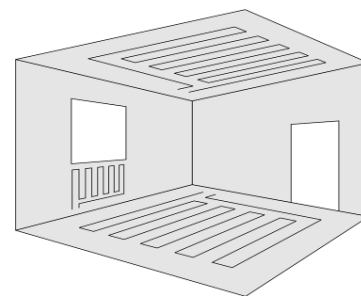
Examples of an ERHS built into the floor, wall and ceiling mounted
